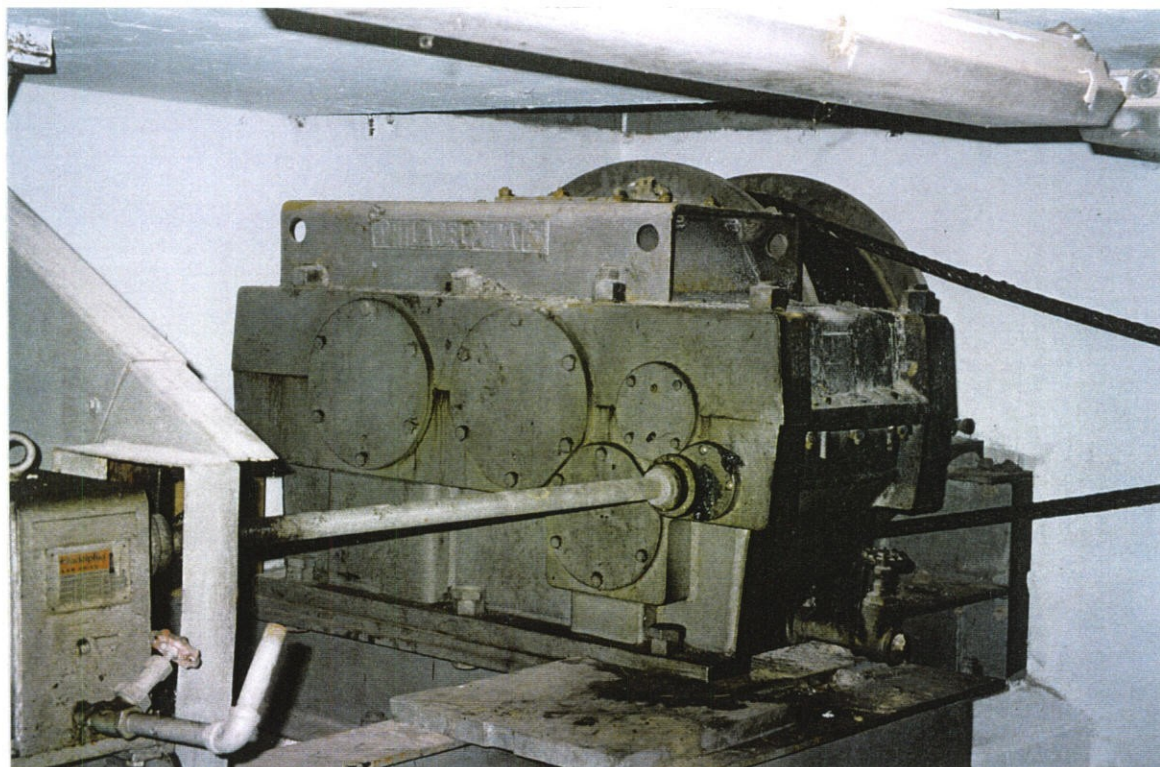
DOUBLE DRUM HOIST USED TO OPEN AND CLOSE GATE SECTOR.
